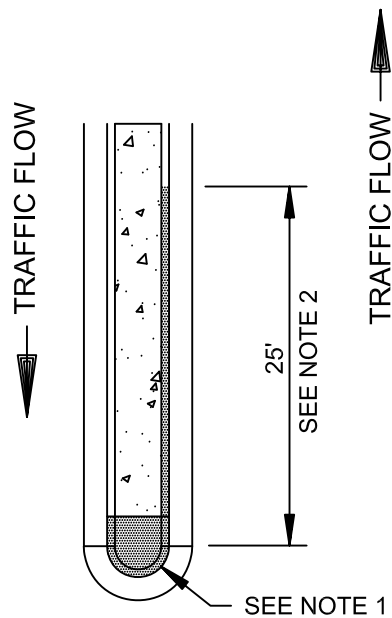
TOWN OF GILBERT STANDARD DETAIL	PAVEMENT MARKING EXTENSIONS THROUGH INTERSECTIONS	REVISED 12/13/07	DETAIL NO. 302
